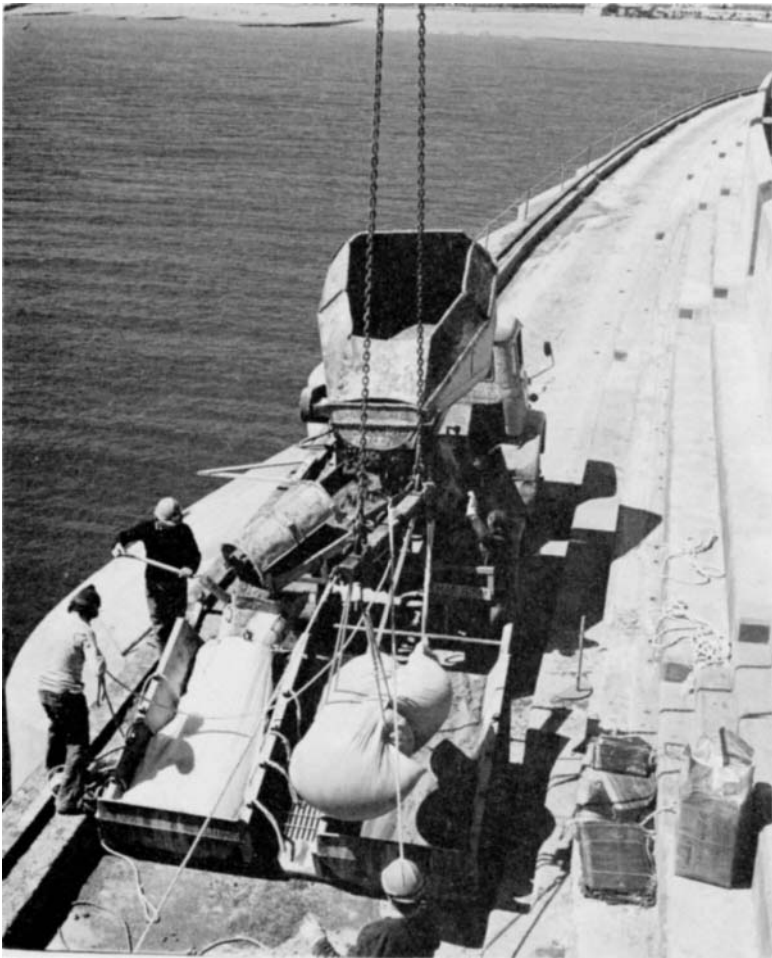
Concrete placement using prefilled concrete bags. (Reproduced with the permission of the Concrete Society)
